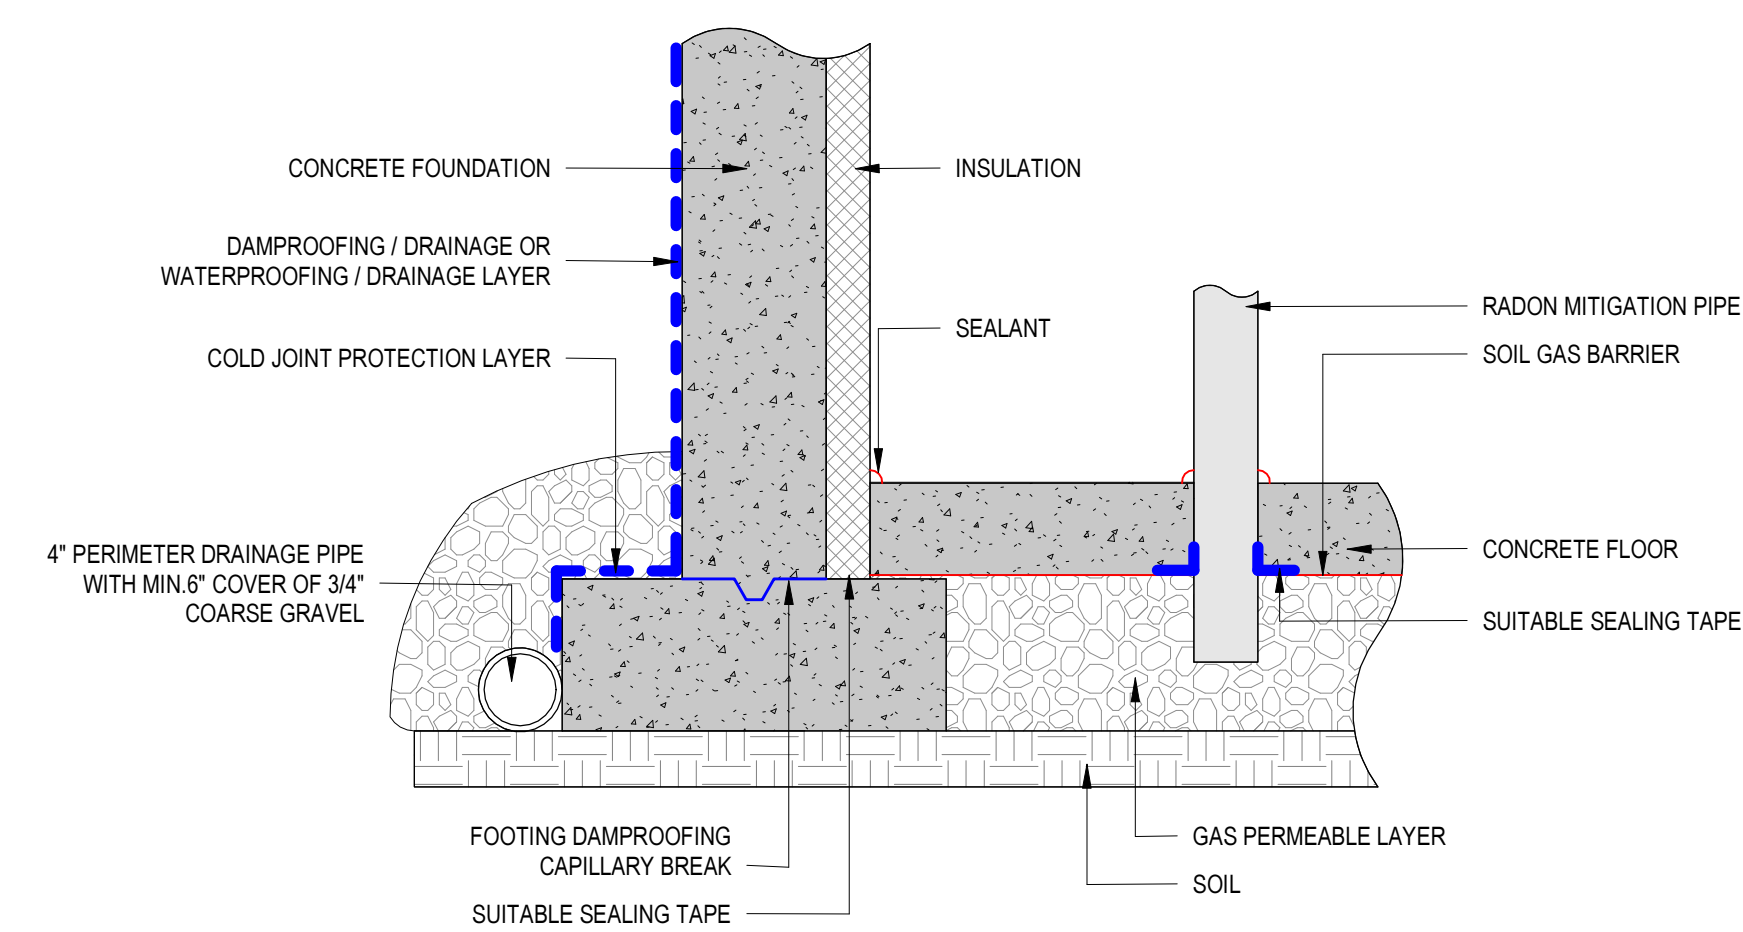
SEALING SUB-SLAB MEMBRANE HORIZONTALLY TO CONCRETE FOOTING WHEN INSULATION IS BETWEEN THE FOUNDATION WALL AND FLOOR SLAB
